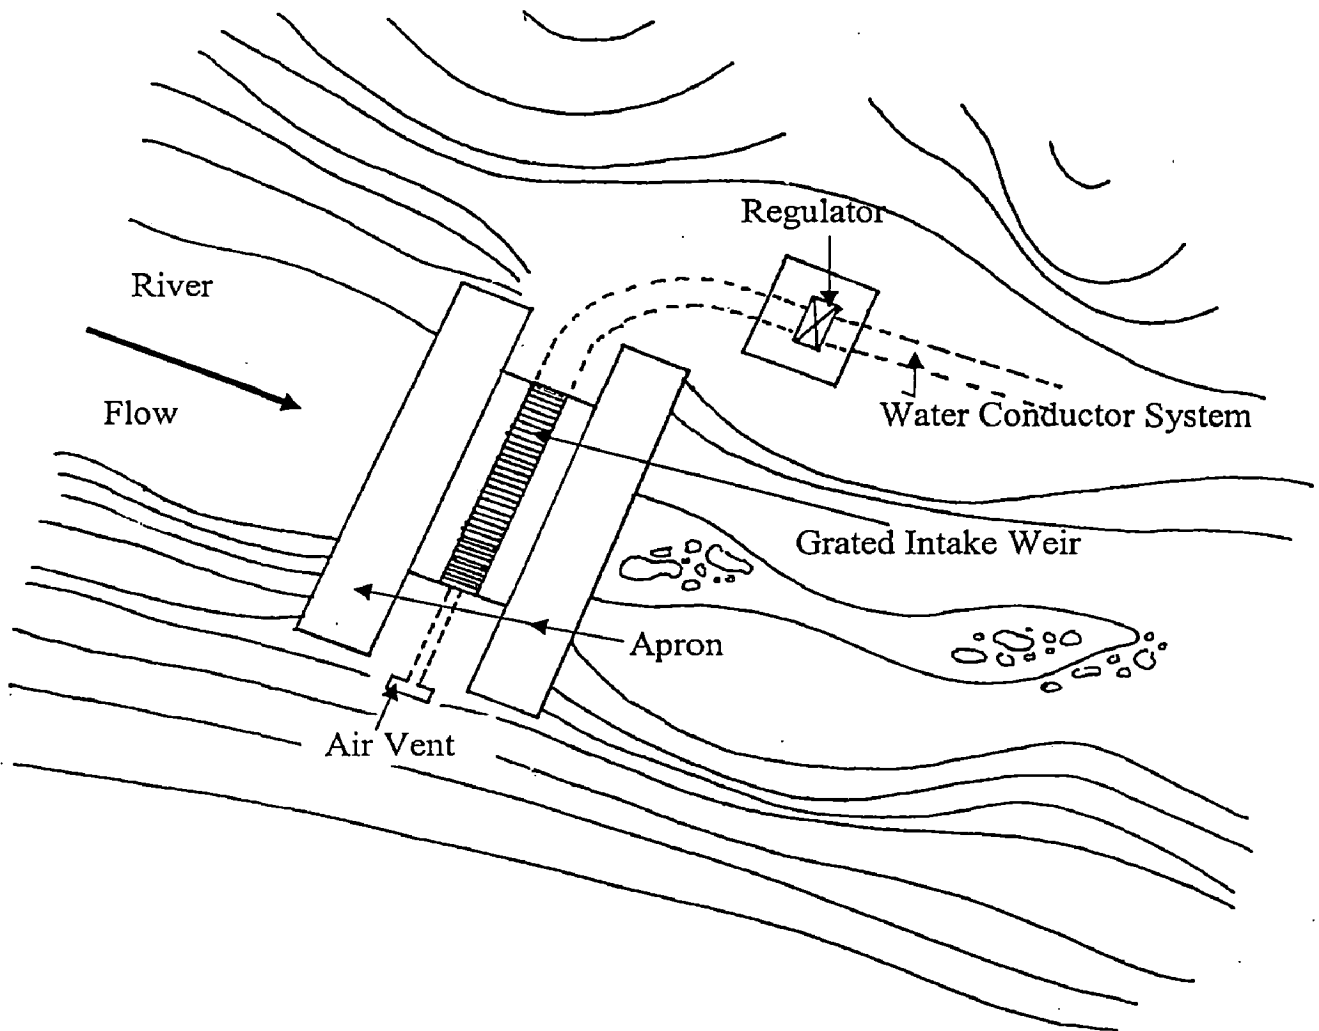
A MINI HYDRO HEADWORKS IN SHINGSHAN COUNTRY, HUBEI PROVINCE, CHINA^[51]
